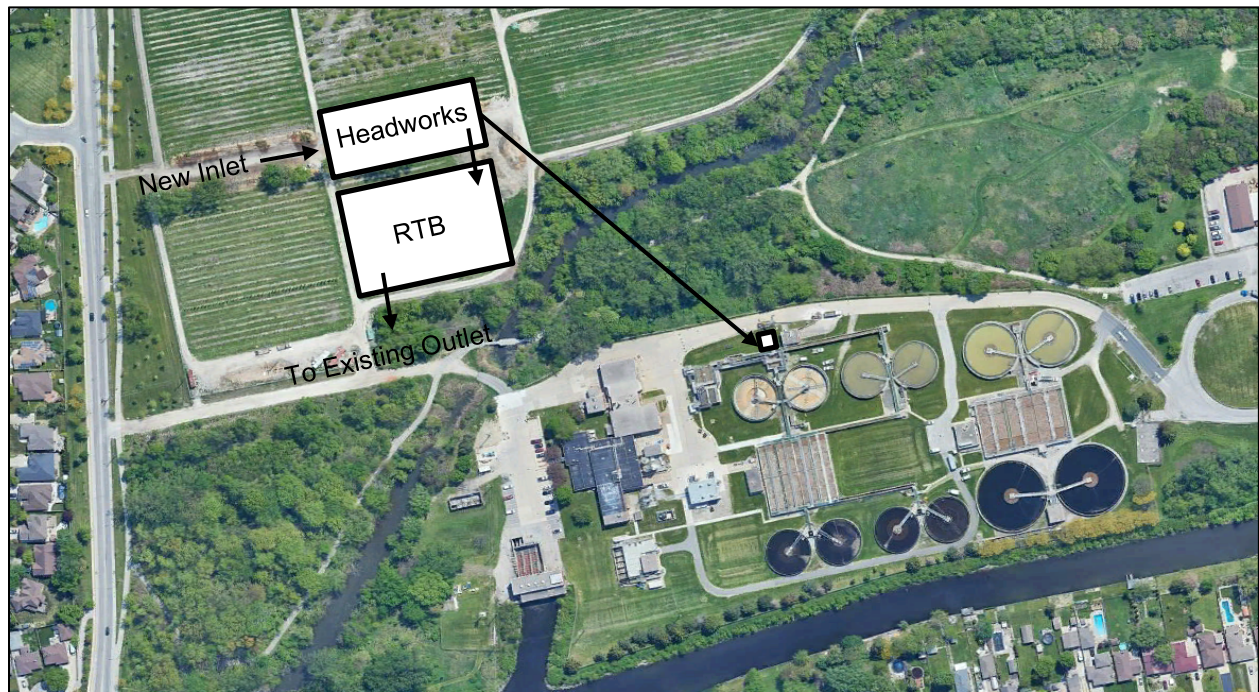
Conceptual Layout of the LRPCP RTB and New Headworks Facilities
